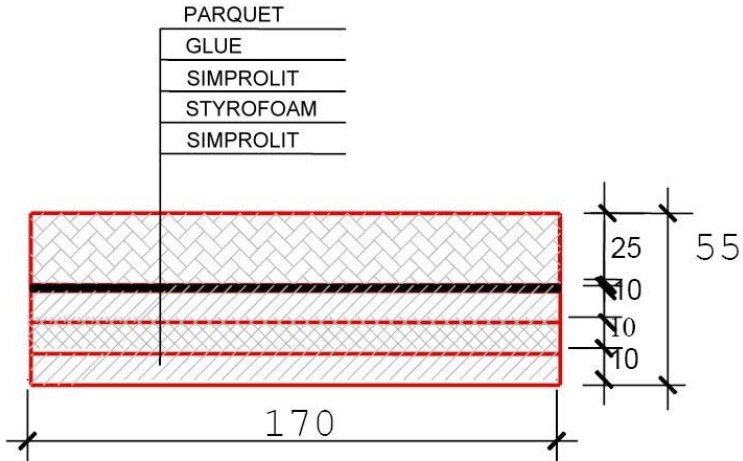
The specimens of Simprolit single-layered (SOP) and three-layered prefabricated floor plates
